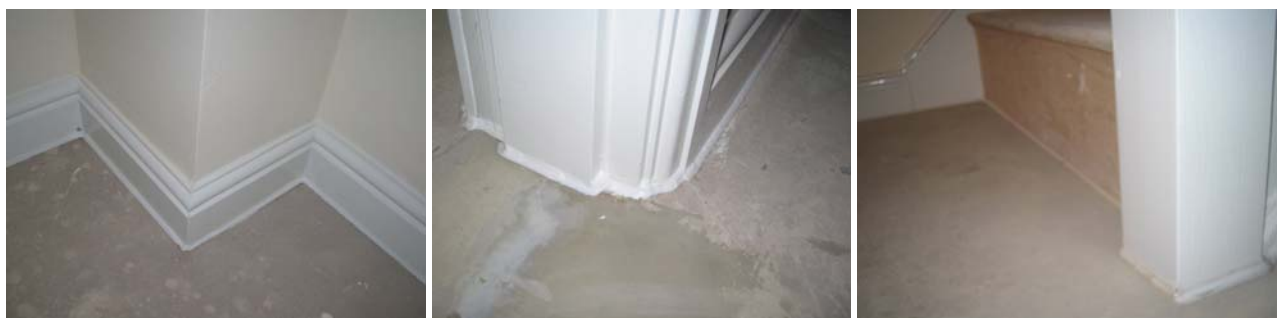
Secondary sealing of the floor perimeters in the dining room and hall.
